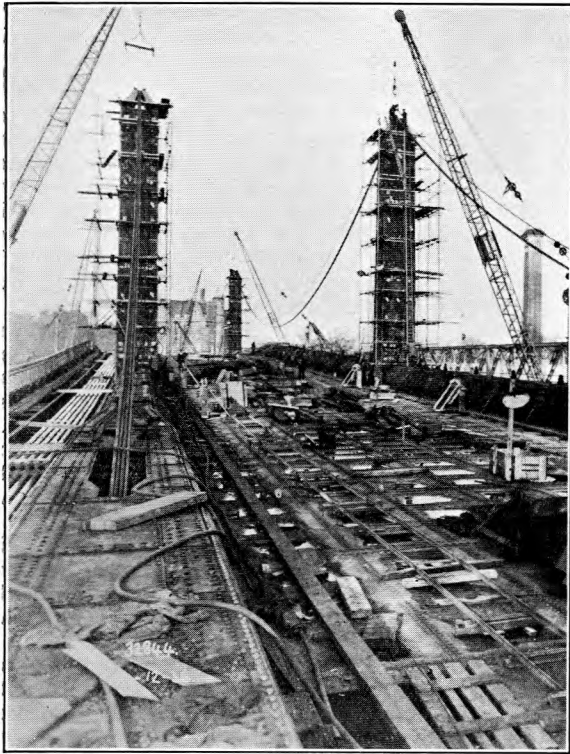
VIEW OF BRIDGE UNDER CONSTRUCTION.
